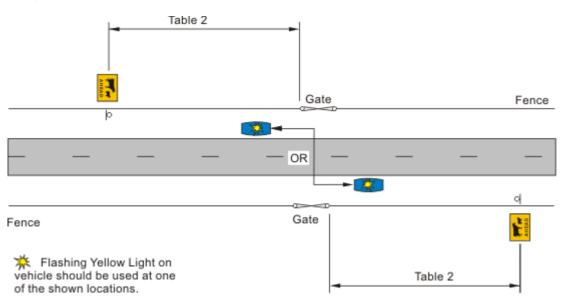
Typical Stock Crossing Site – for bitumen roads.
